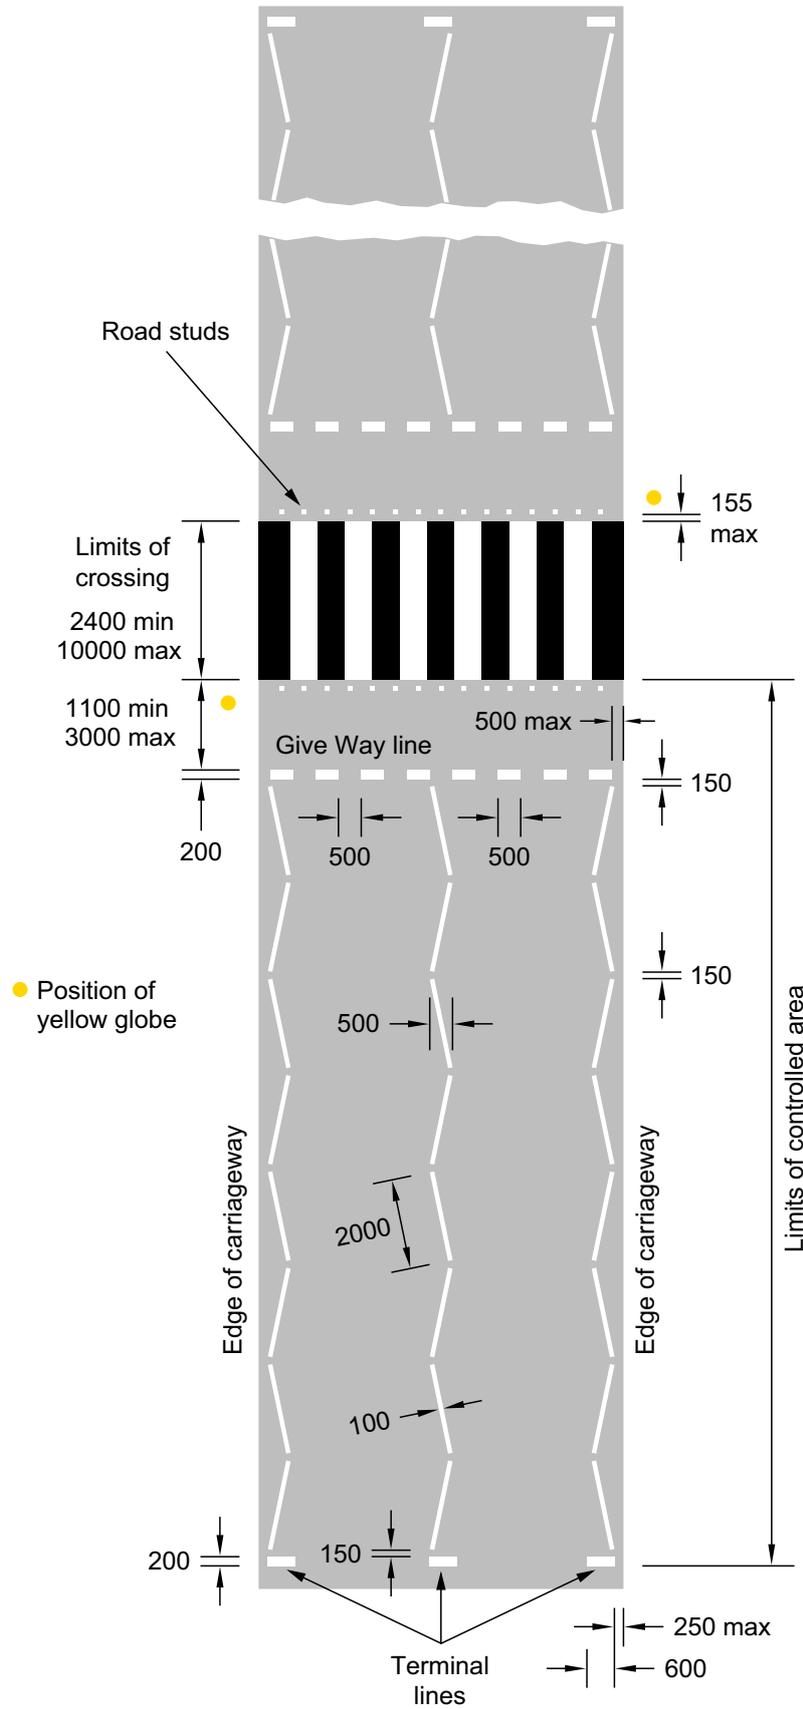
Diagram 1001.4 (S14-2-52): Road markings indicating a Zebra crossing
